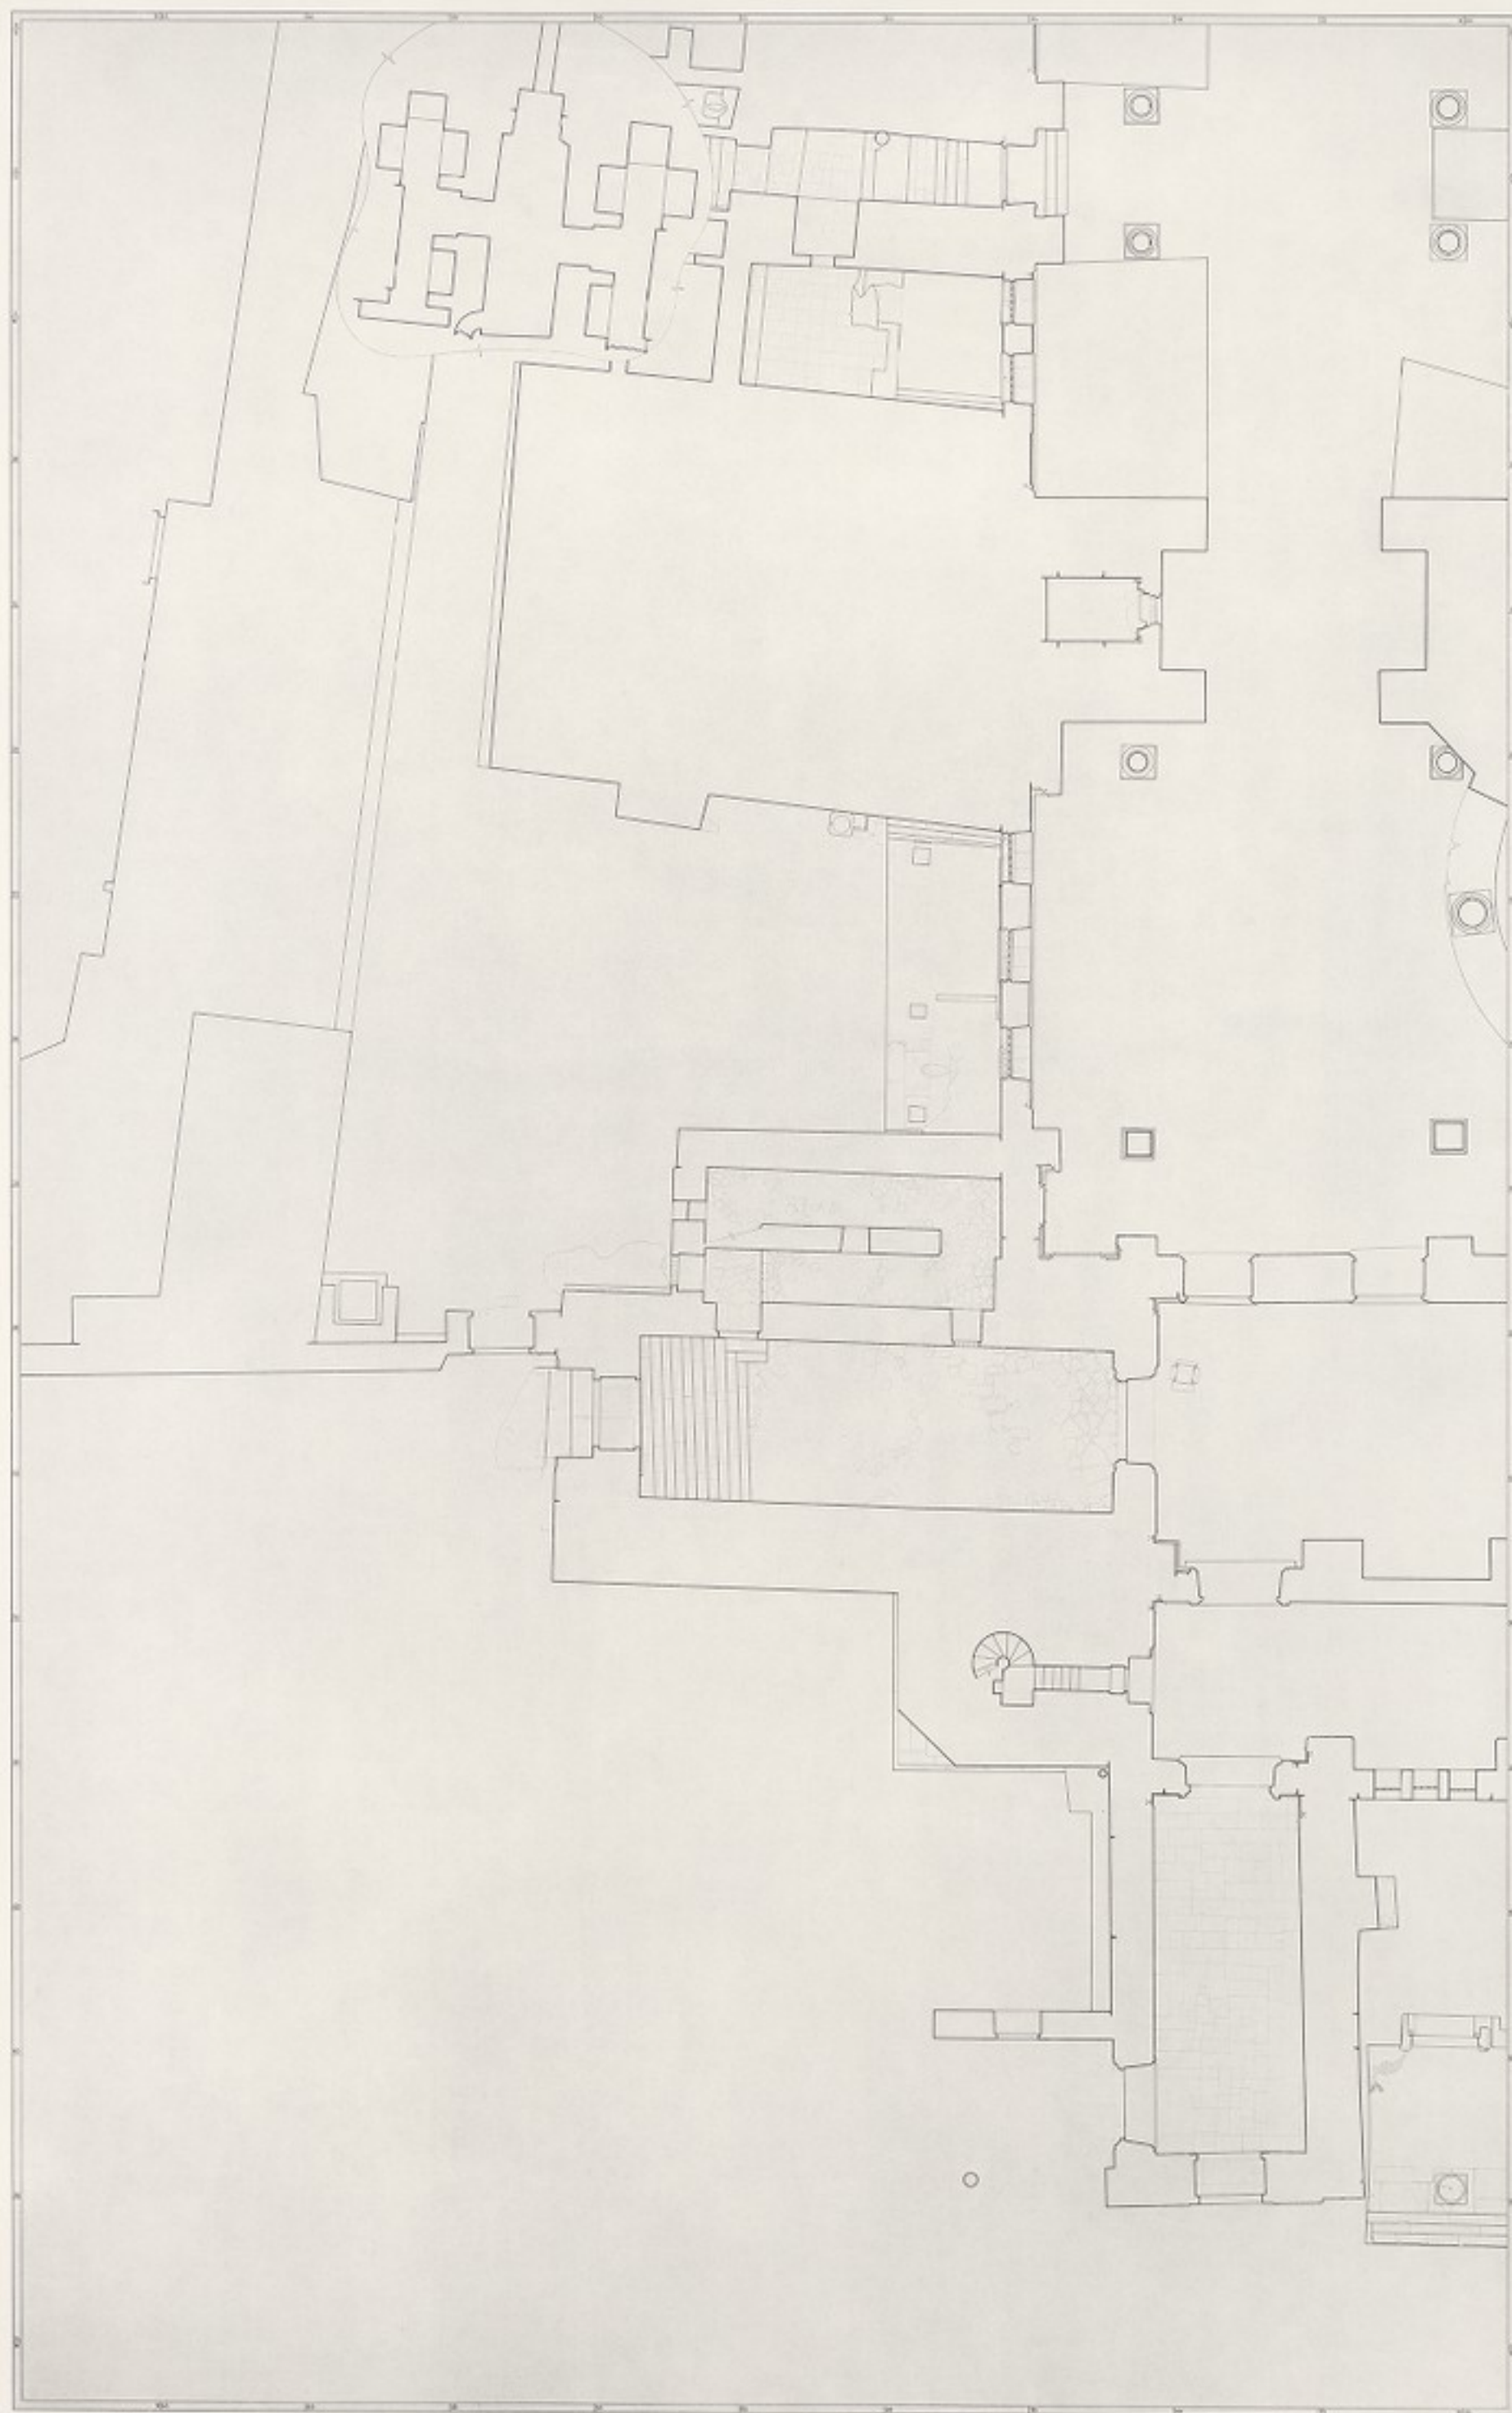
PLAN AT GROUND LEVEL, NORTHWESTERN EXTERIOR AREAS:
